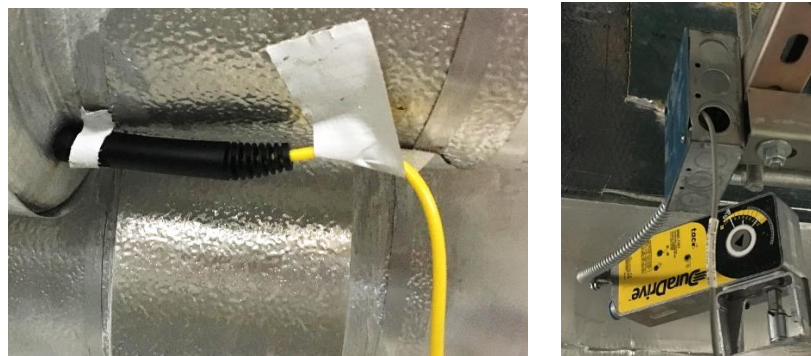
Type K thermocouple installed and penetrated through the insulation and 0-10 VDC cable installed to actuator valve of chiller water pipe
